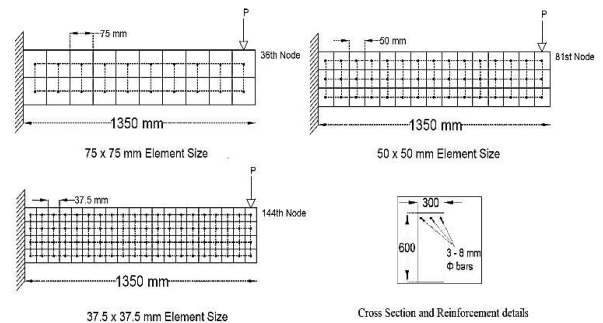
Discretization of RC beam, Cross section & Reinforcement details
